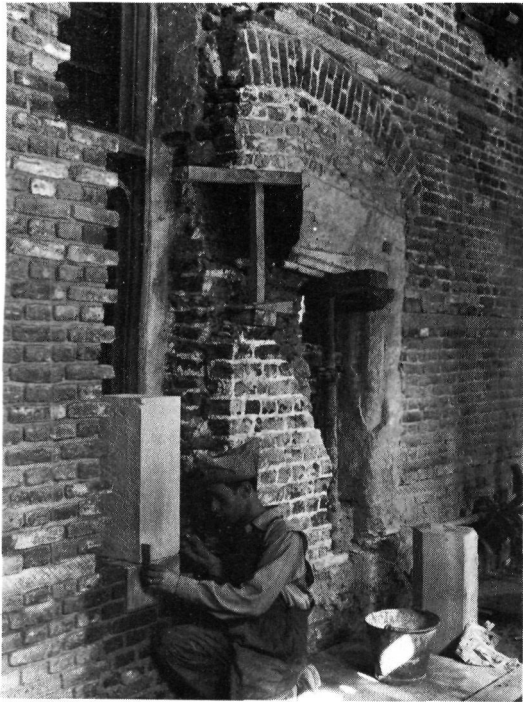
Whitehall: Gallery between the tennis plays, remains of fireplace in north wall (first floor) (Crown Copyright)
